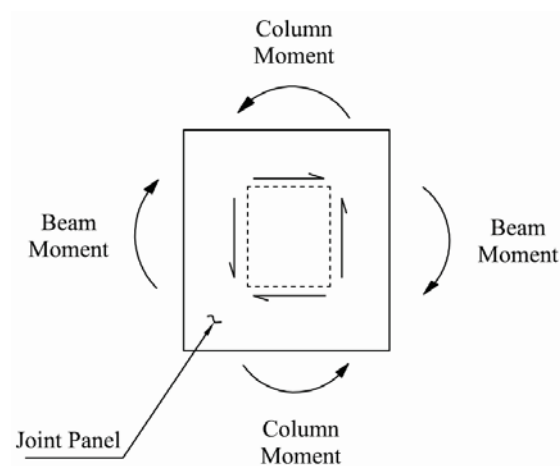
Panel zone shear caused by beam and column moments at the joint (Krishnan and Hall 2006)
